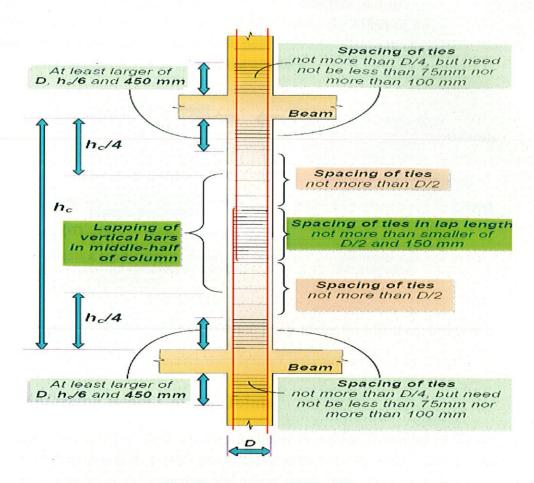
Ductile detailing of column as per IS: 13920 – 1993
